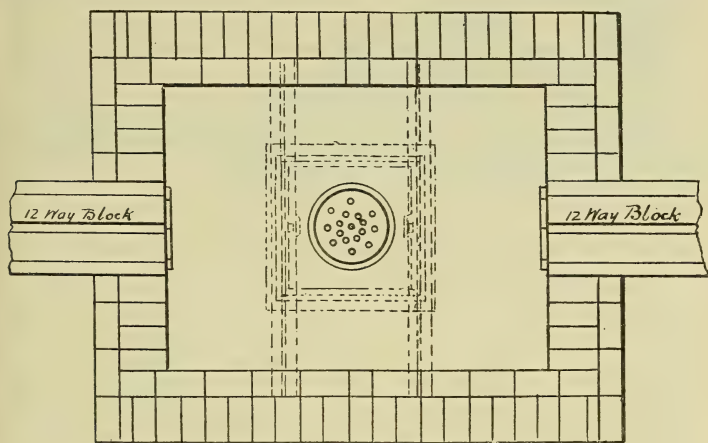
Plan of Manhole under Roadway (Scale $\frac{1}{32}$)
